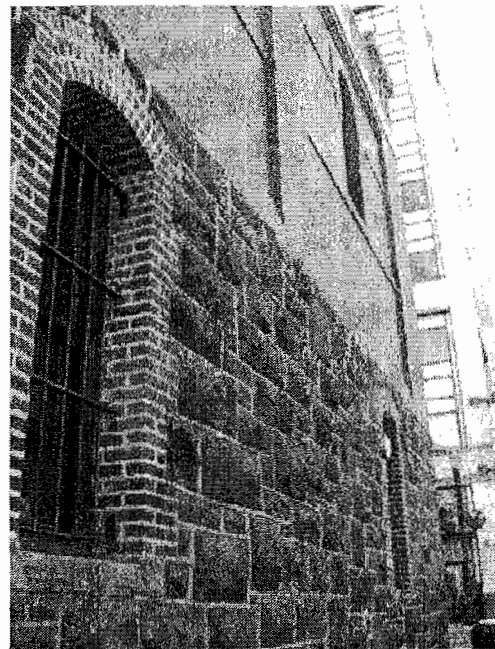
The west façade facing Davis Street and the Vera Katz silver park features the random ashlar first floor, exposed brick-framed vertical gun-slot windows, and red painted brick second floor. Photo by author, 2009.
